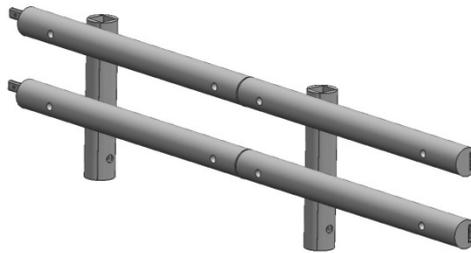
Structure of Steel Backing Wood Landscape Guardrail
